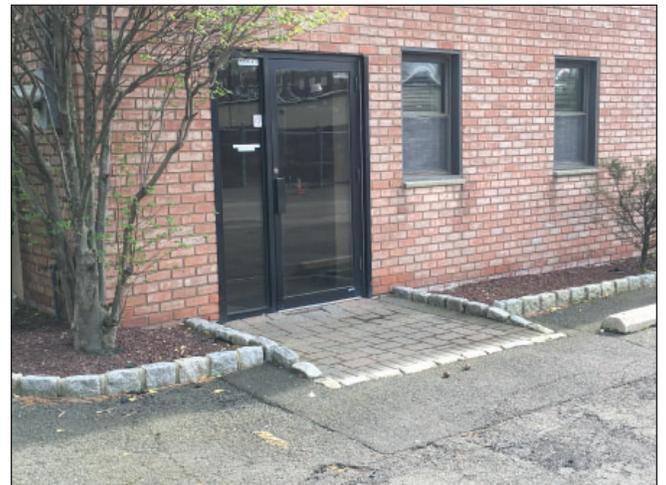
View of the rear facade and parking area depicting the roof leader drains directly onto the asphalt, doorways raised above the parking area.
